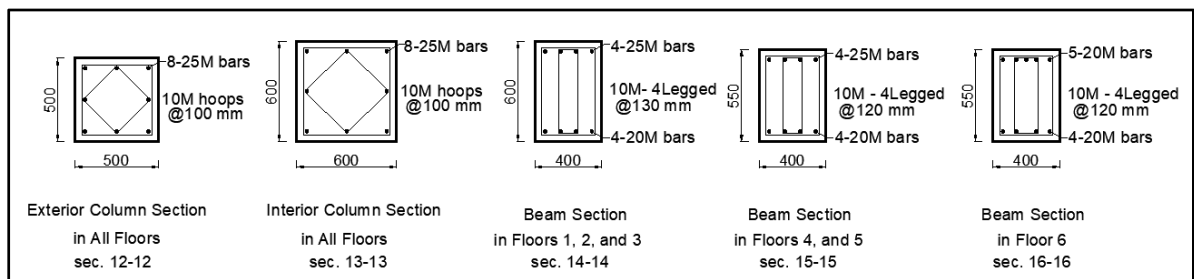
Reinforcing details of the moderately ductile frame members in Montreal
